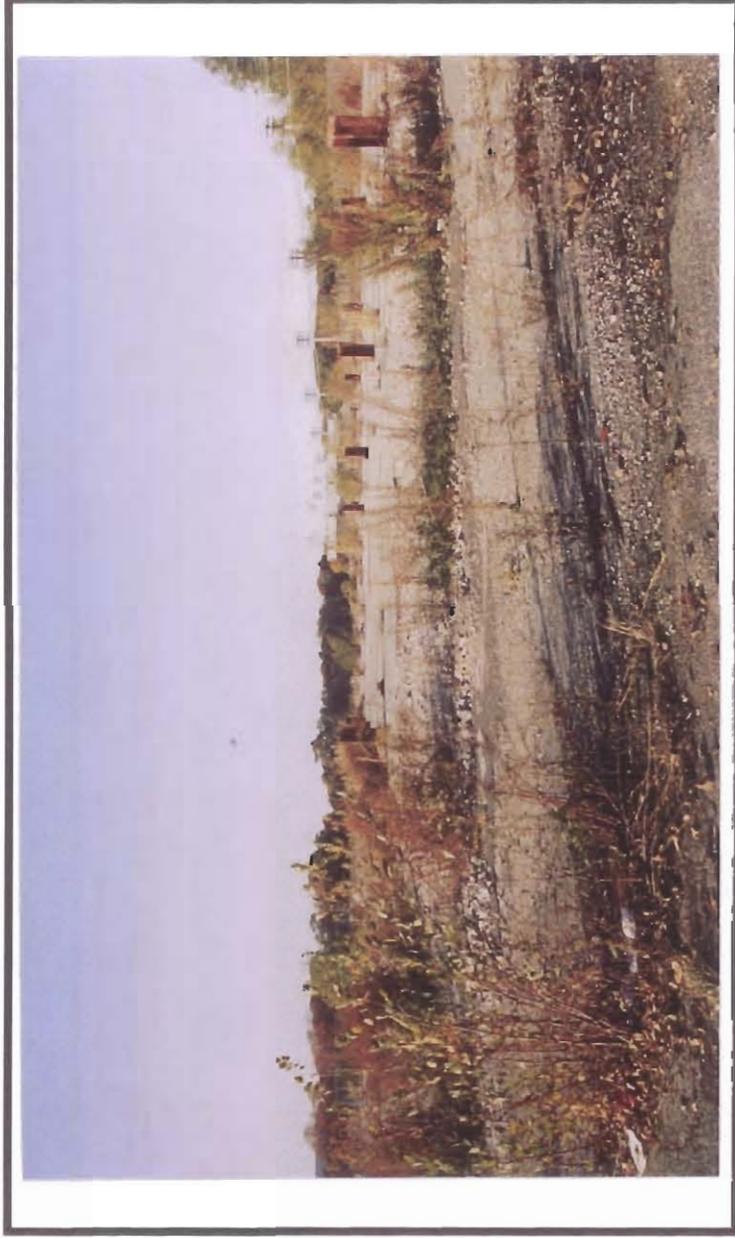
View to northeast from floor of Plant No. 2. Vegetation is beginning to invade floor of former building. By the early 20th century the design of automobile manufacturing plants had become standardize, with Ford providing the model. As indicated by the arrangement of the columns that supported the roof, the plant was designed on a grid pattern that could be replicated and expanded to meet future needs.
